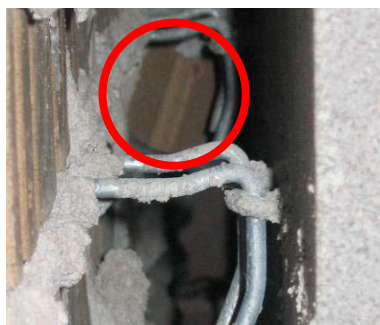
Pull-out failure of connectors in Specimen UT CMU 1
